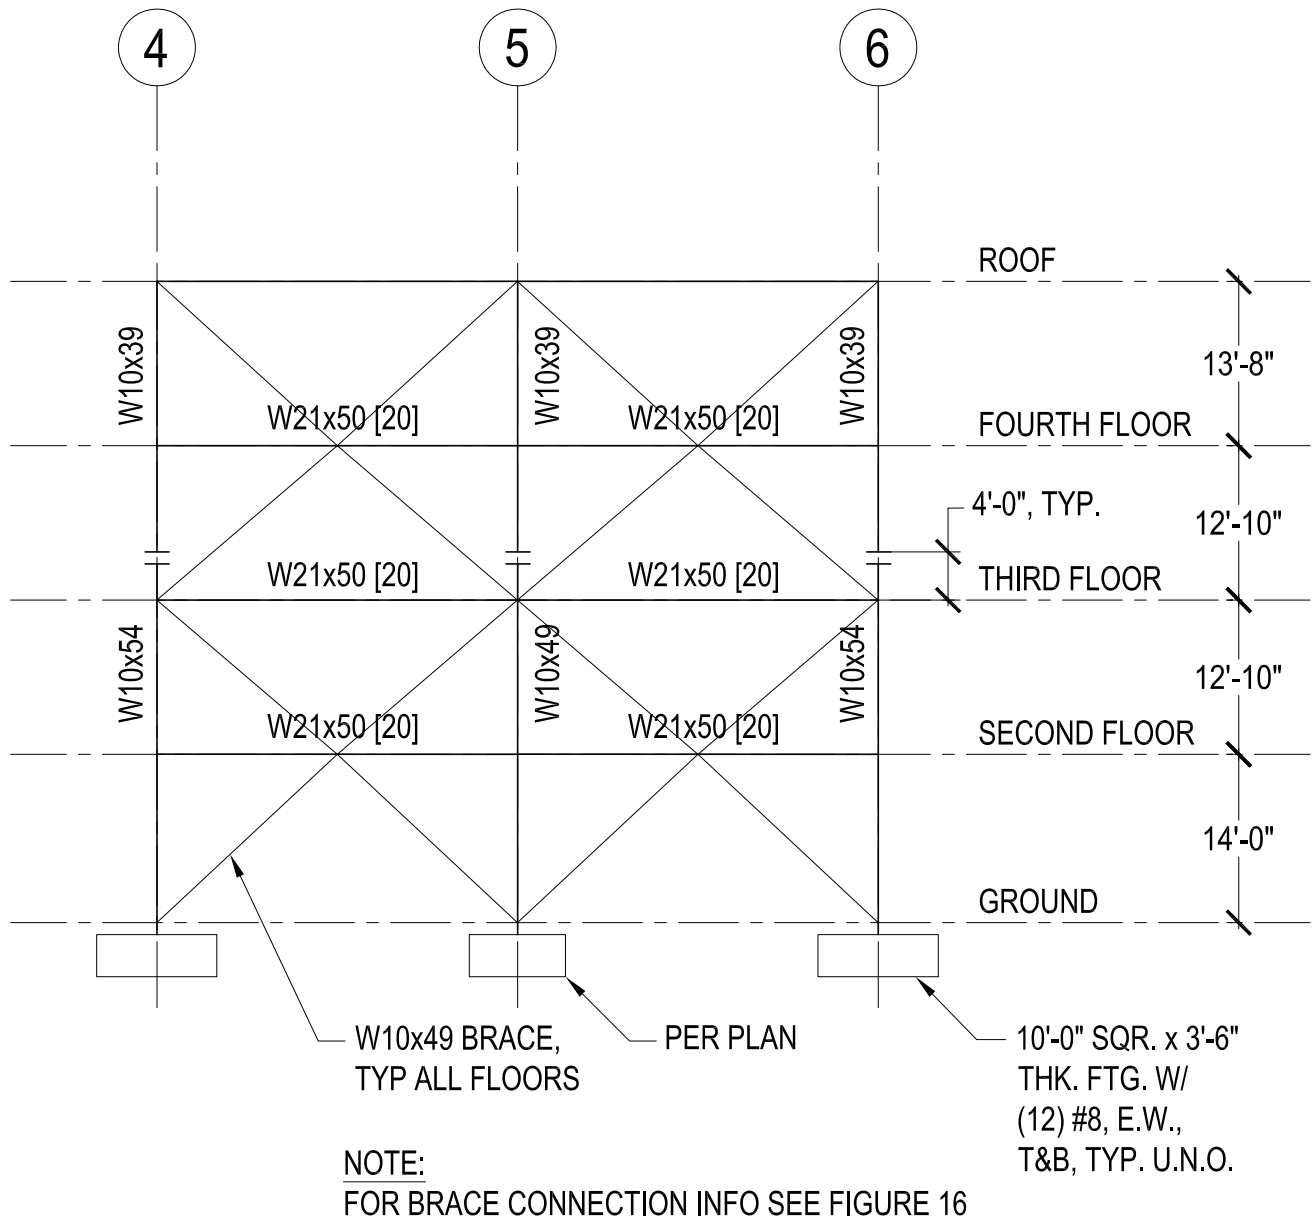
BRACED FRAME ELEVATION (N-S DIRECTION)
